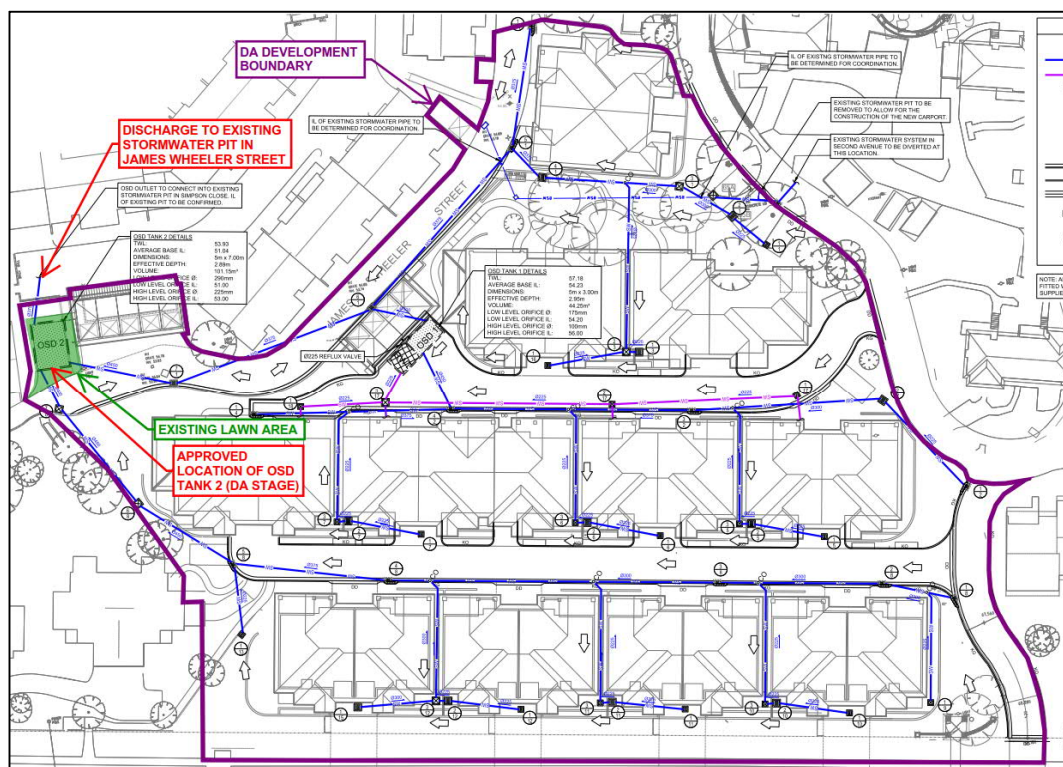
Approved Stormwater Layout Plan (DA Stage)
